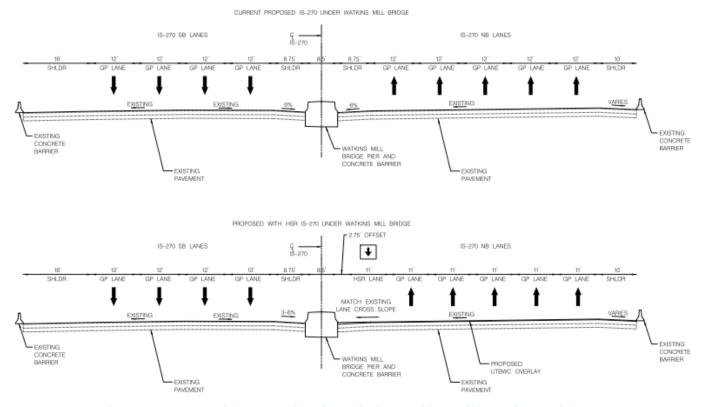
Proposed cross section through the Watkins Mill Road Interchange.
